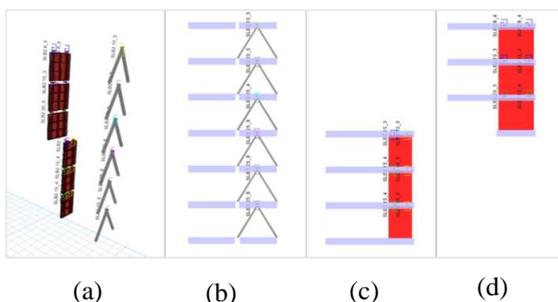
ELEVATION OF SLB HEATSINKS, USED IN THE TYPE B MODEL
